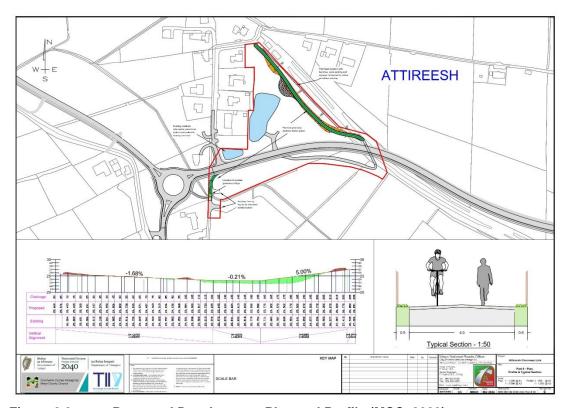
Proposed Development Plan and Profile (MCC, 2023)
